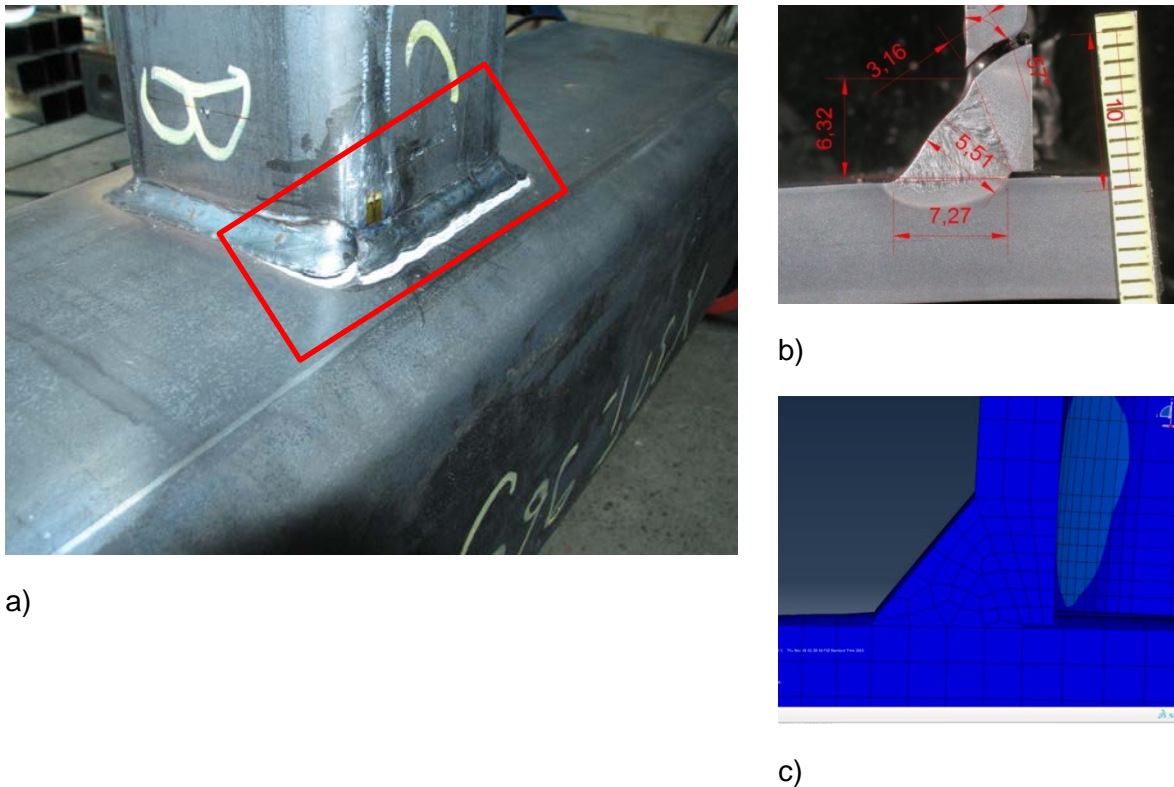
Failure mode of X3TT_960 initiated in the weld or heat affected zone of the weld. The weld start/termination introduced a prominent discontinuity (and weakness) in the weld.
